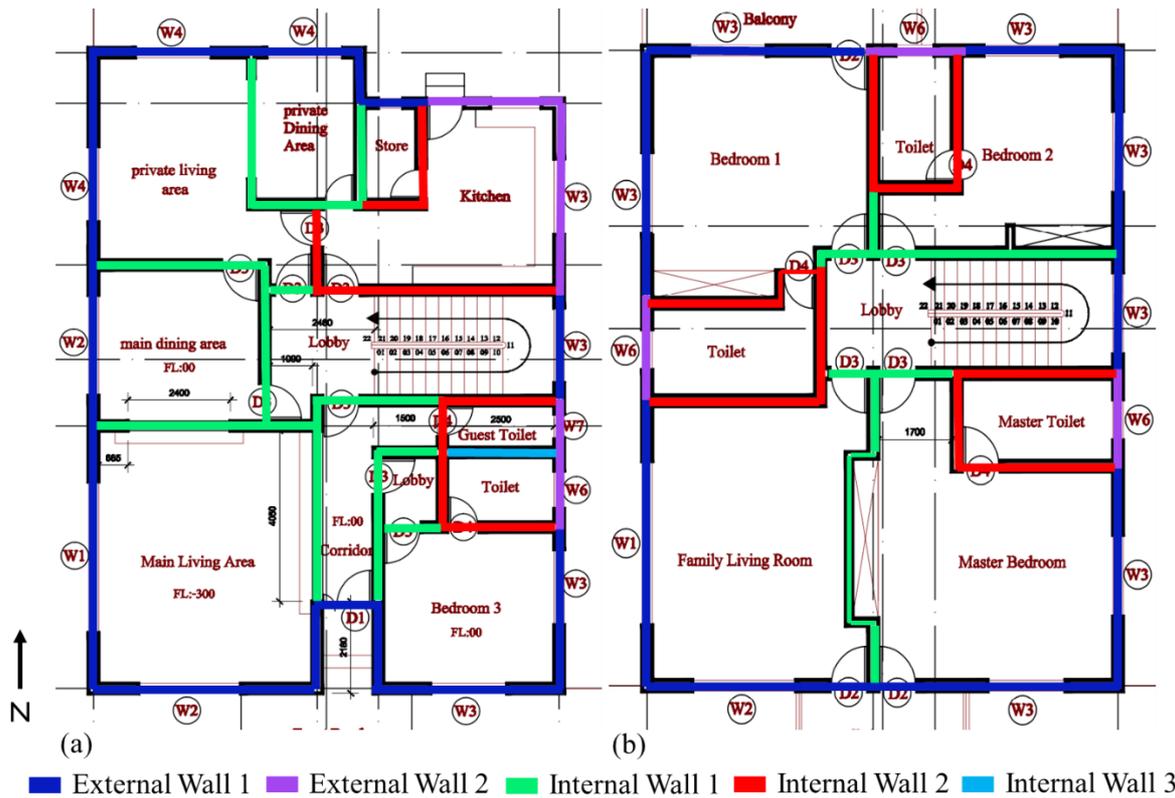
3: Construction materials distribution: Base Variants (a) Ground Floor (b) First Floor
